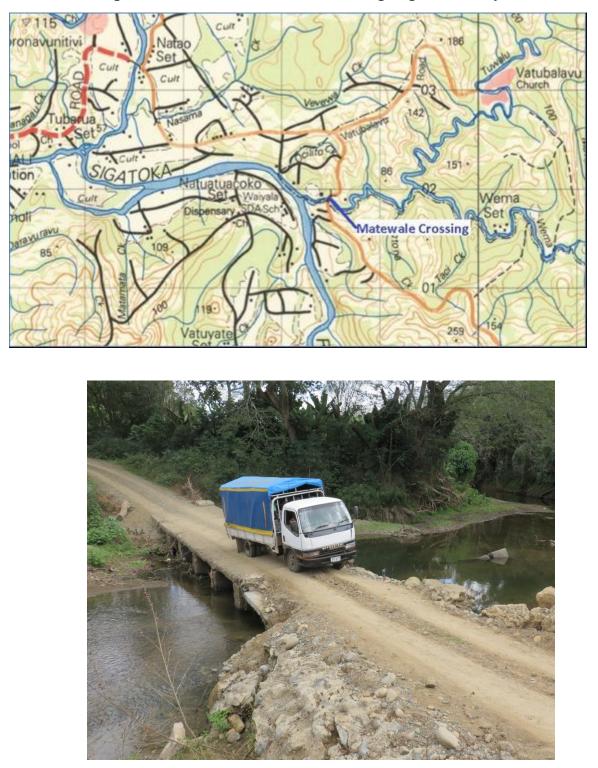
Location of Matewale Crossing, Sigatoka Valley Road
